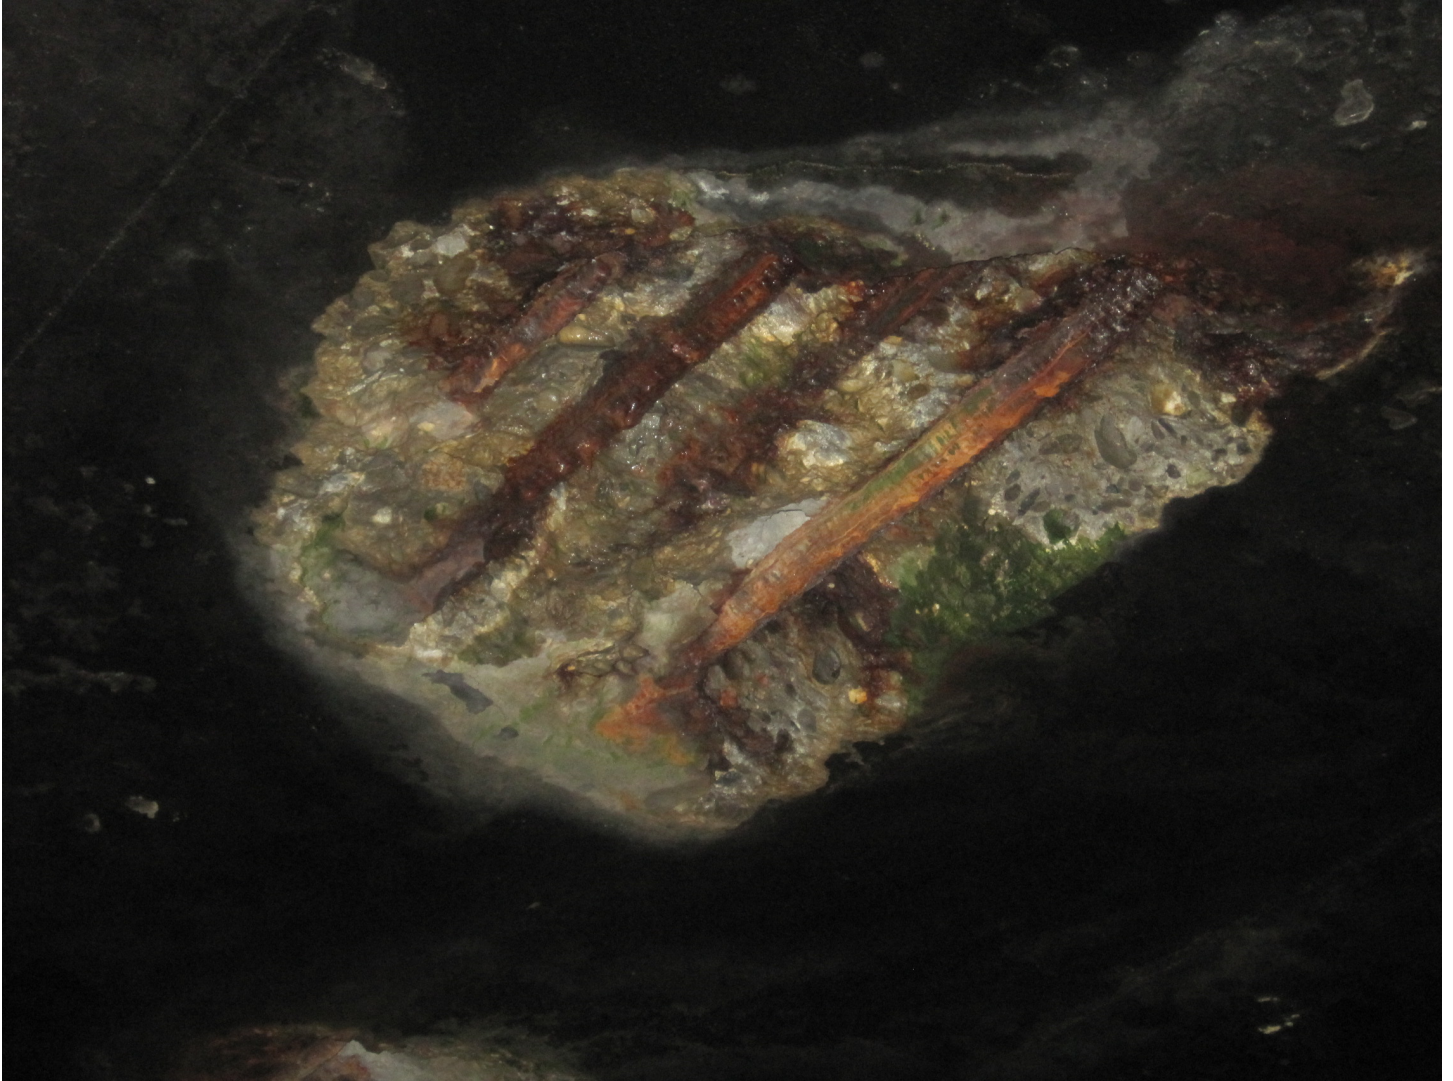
Spalling concrete and exposed/corroded rebar
